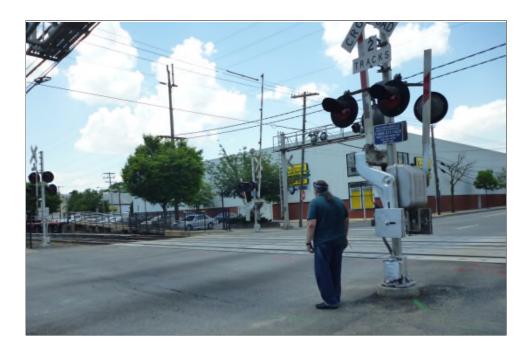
New Hyde Park Road grade crossing looking northwest. Note commercial building on northwest corner of crossing – 115 New Hyde Park Road – is a potential property taking.
